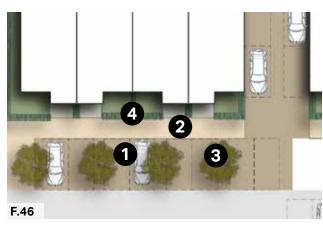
Illustrative diagram showing an indicative layout of on-street perpendicular echelon parking
